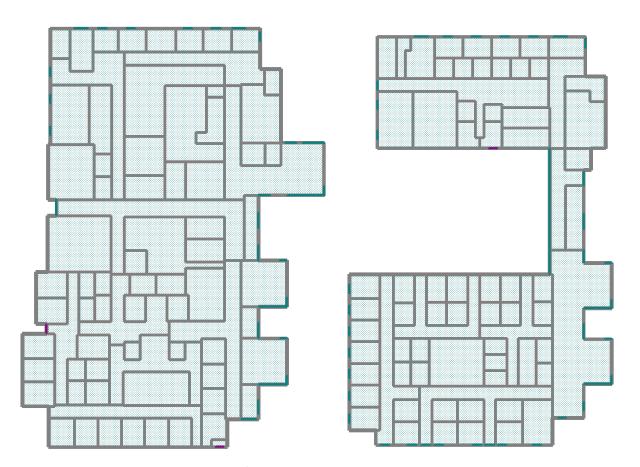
1st Floor zoning/floorplan of *eQUEST* model
